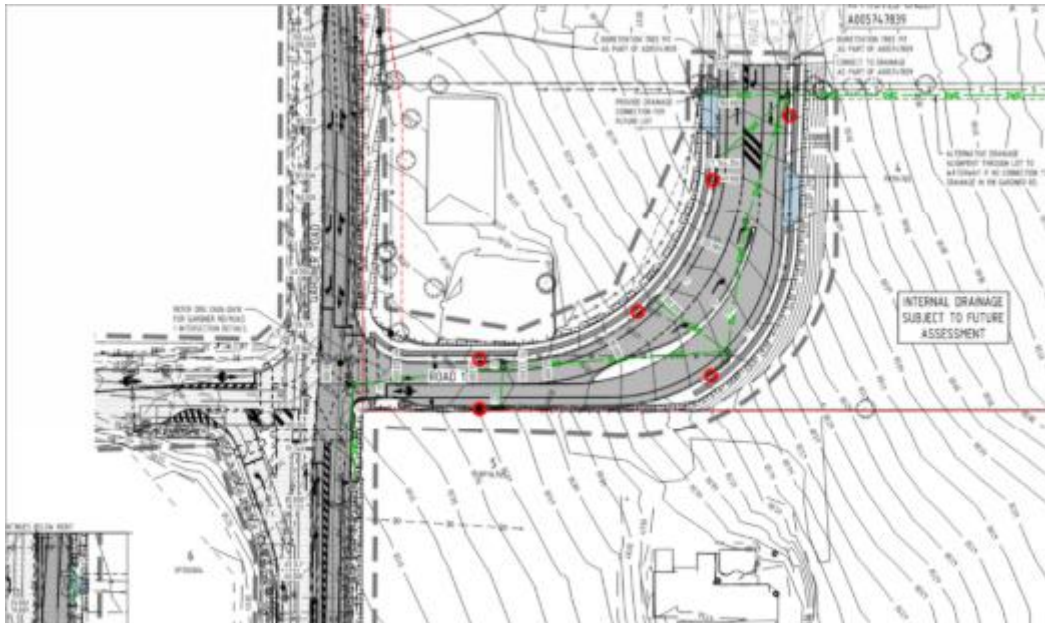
Trunk Road Access through 202 Gardner Road, Rochedale (as proposed by A006738631)
